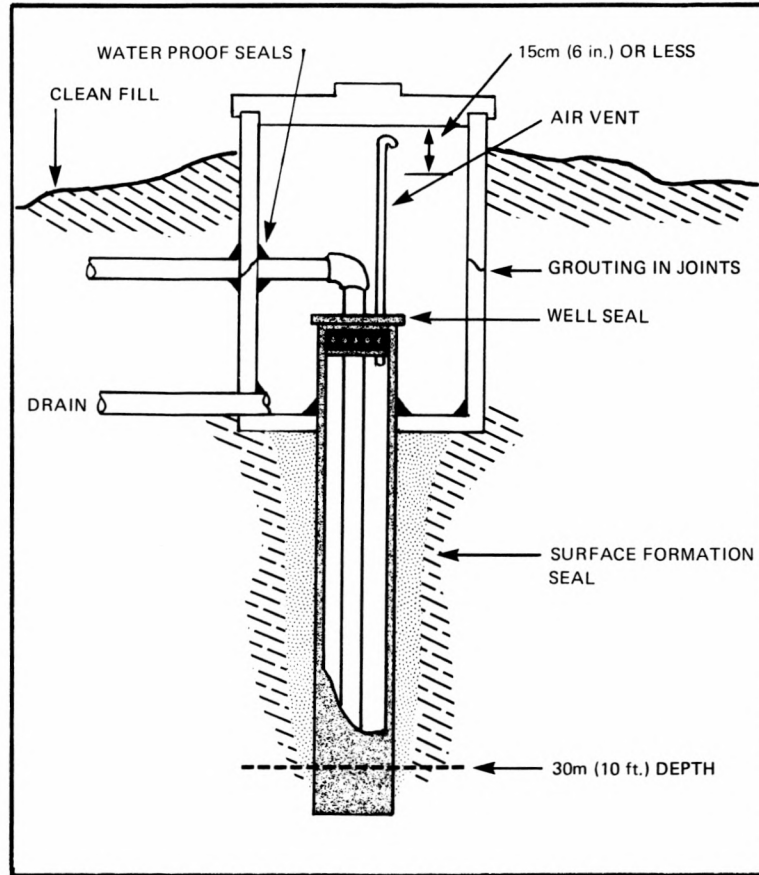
CASING SEAL AND WELL PIT CONSTRUCTION
